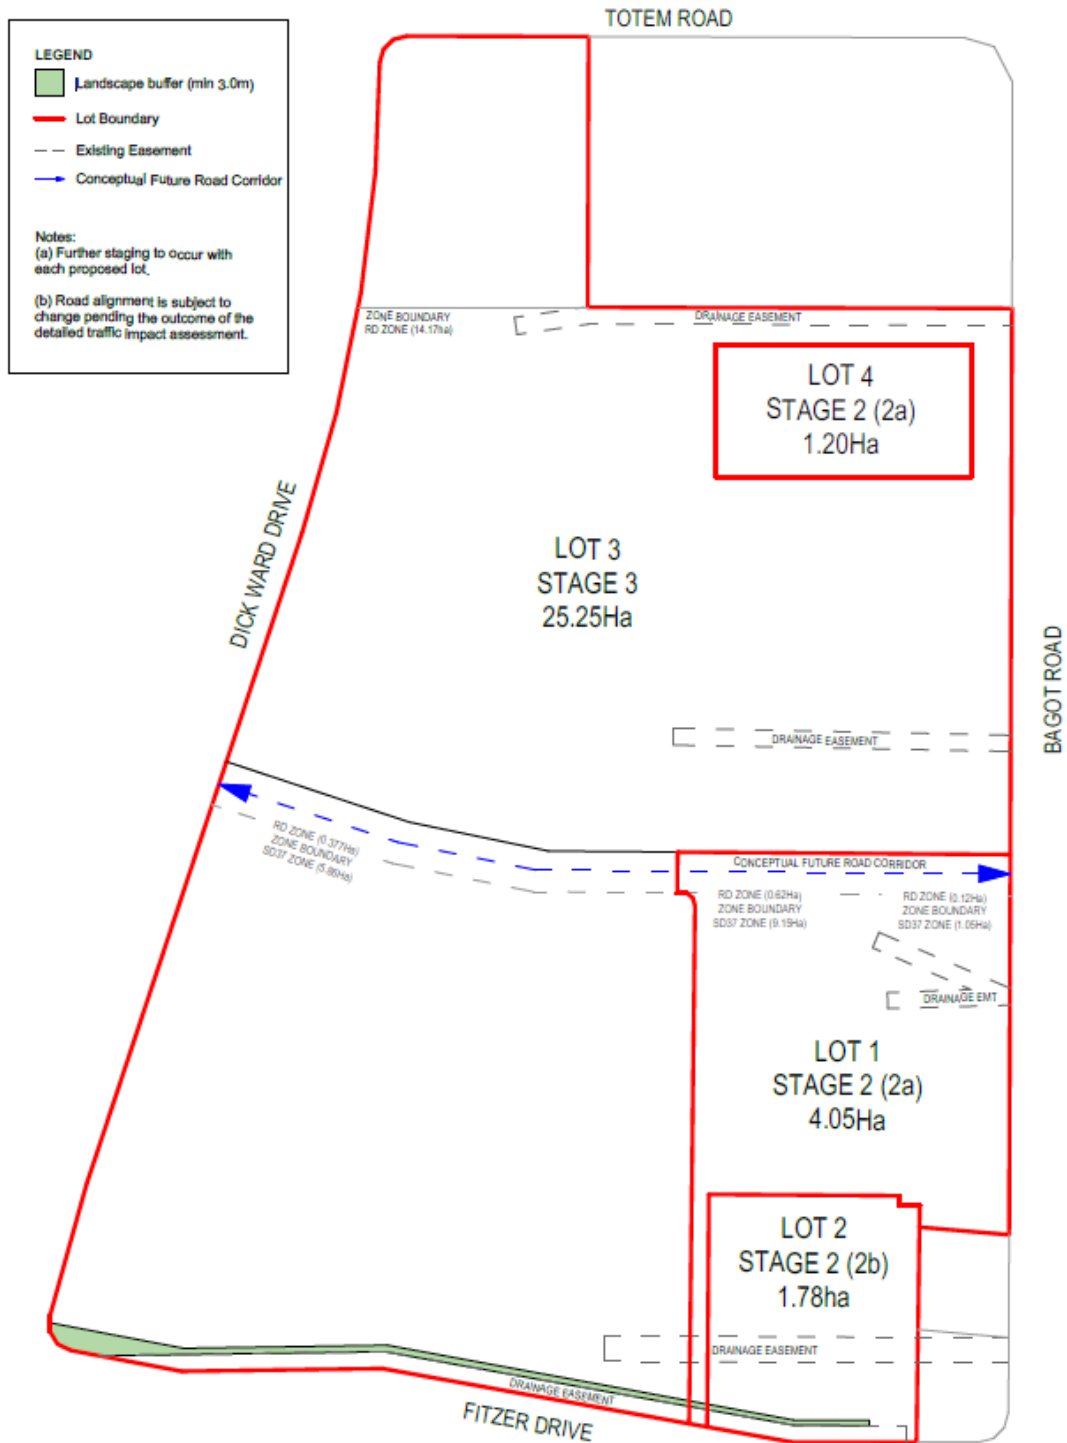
Proposed Subdivision Plan. Note the Access Rd has been included in proposed Lots
